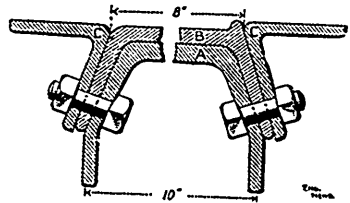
TRANSVERSE SECTION OF RAIL JOINT FOR STEEL RAIL HIGHWAY, of typical Illinois soil, and consisted of a steel rail 1/2 in. thick and 8 ins. wide, with a flange 3 ins. wide turned down on either side and a 3/4-in. flange turned up on the outer edge to keep the wheels on the rails. These rails were let into the ground so that the flat part rested on the earth, and were fastened together at the ends by fish plates, which are so constructed as to run the wheels onto the rails after passing a team. The earth between the rails was removed to a depth of four inches, and the space filled with gravel for a tread for the horses. These
